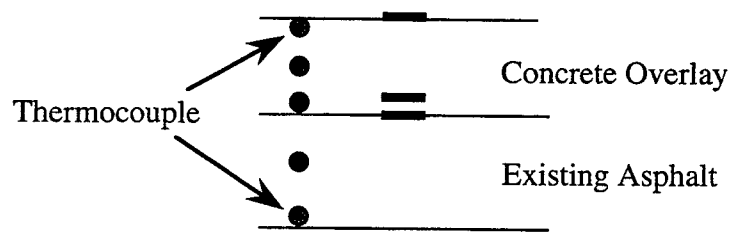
Test Slab 3 Layout for CDOT Project #1.
